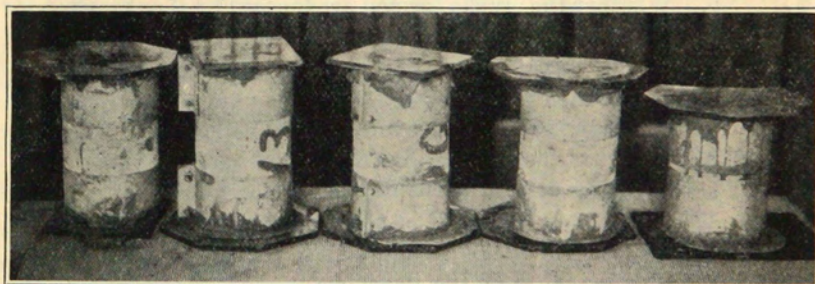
Cores being capped with a 1:1 mix of Lumnite Cement and fine sand. The bands were made out of galvanized iron and fastened on with stove bolts. Glass plates were used on both ends.
